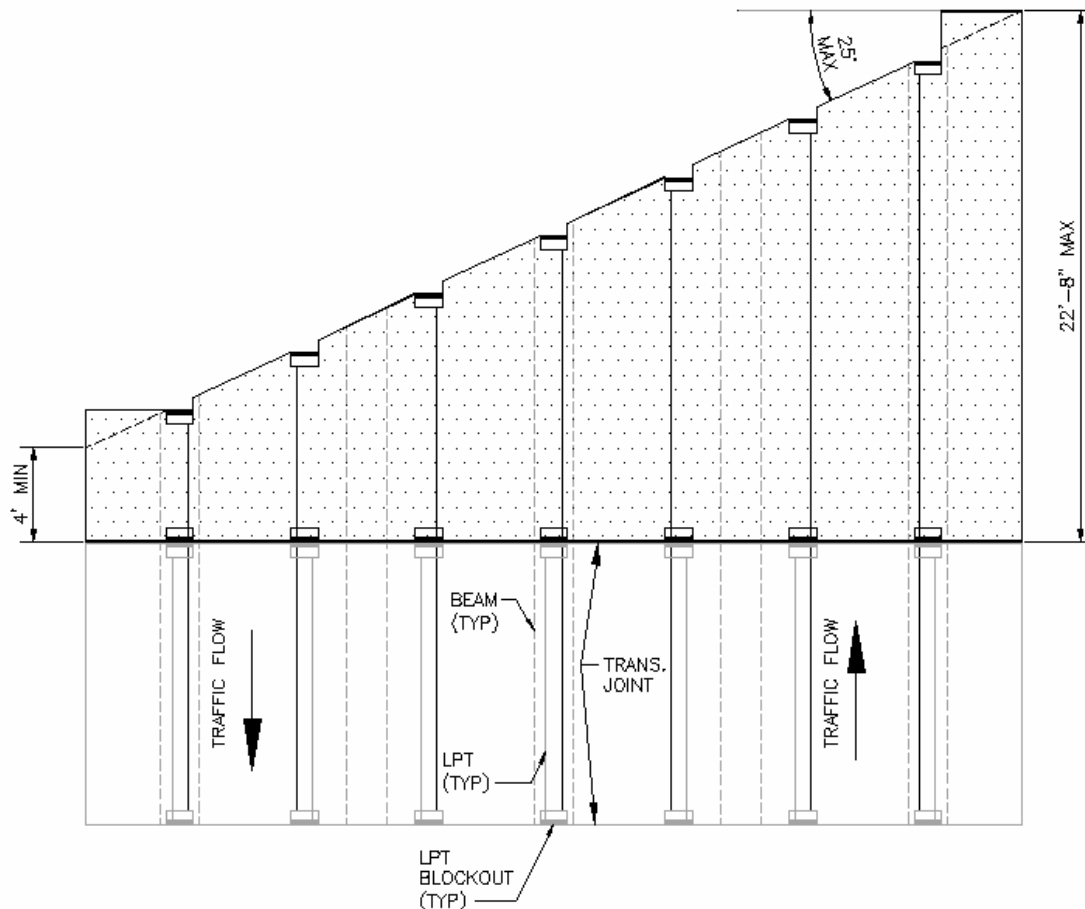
Skewed Panel with LPT Joint Connection (Skews greater than 15 degrees)
